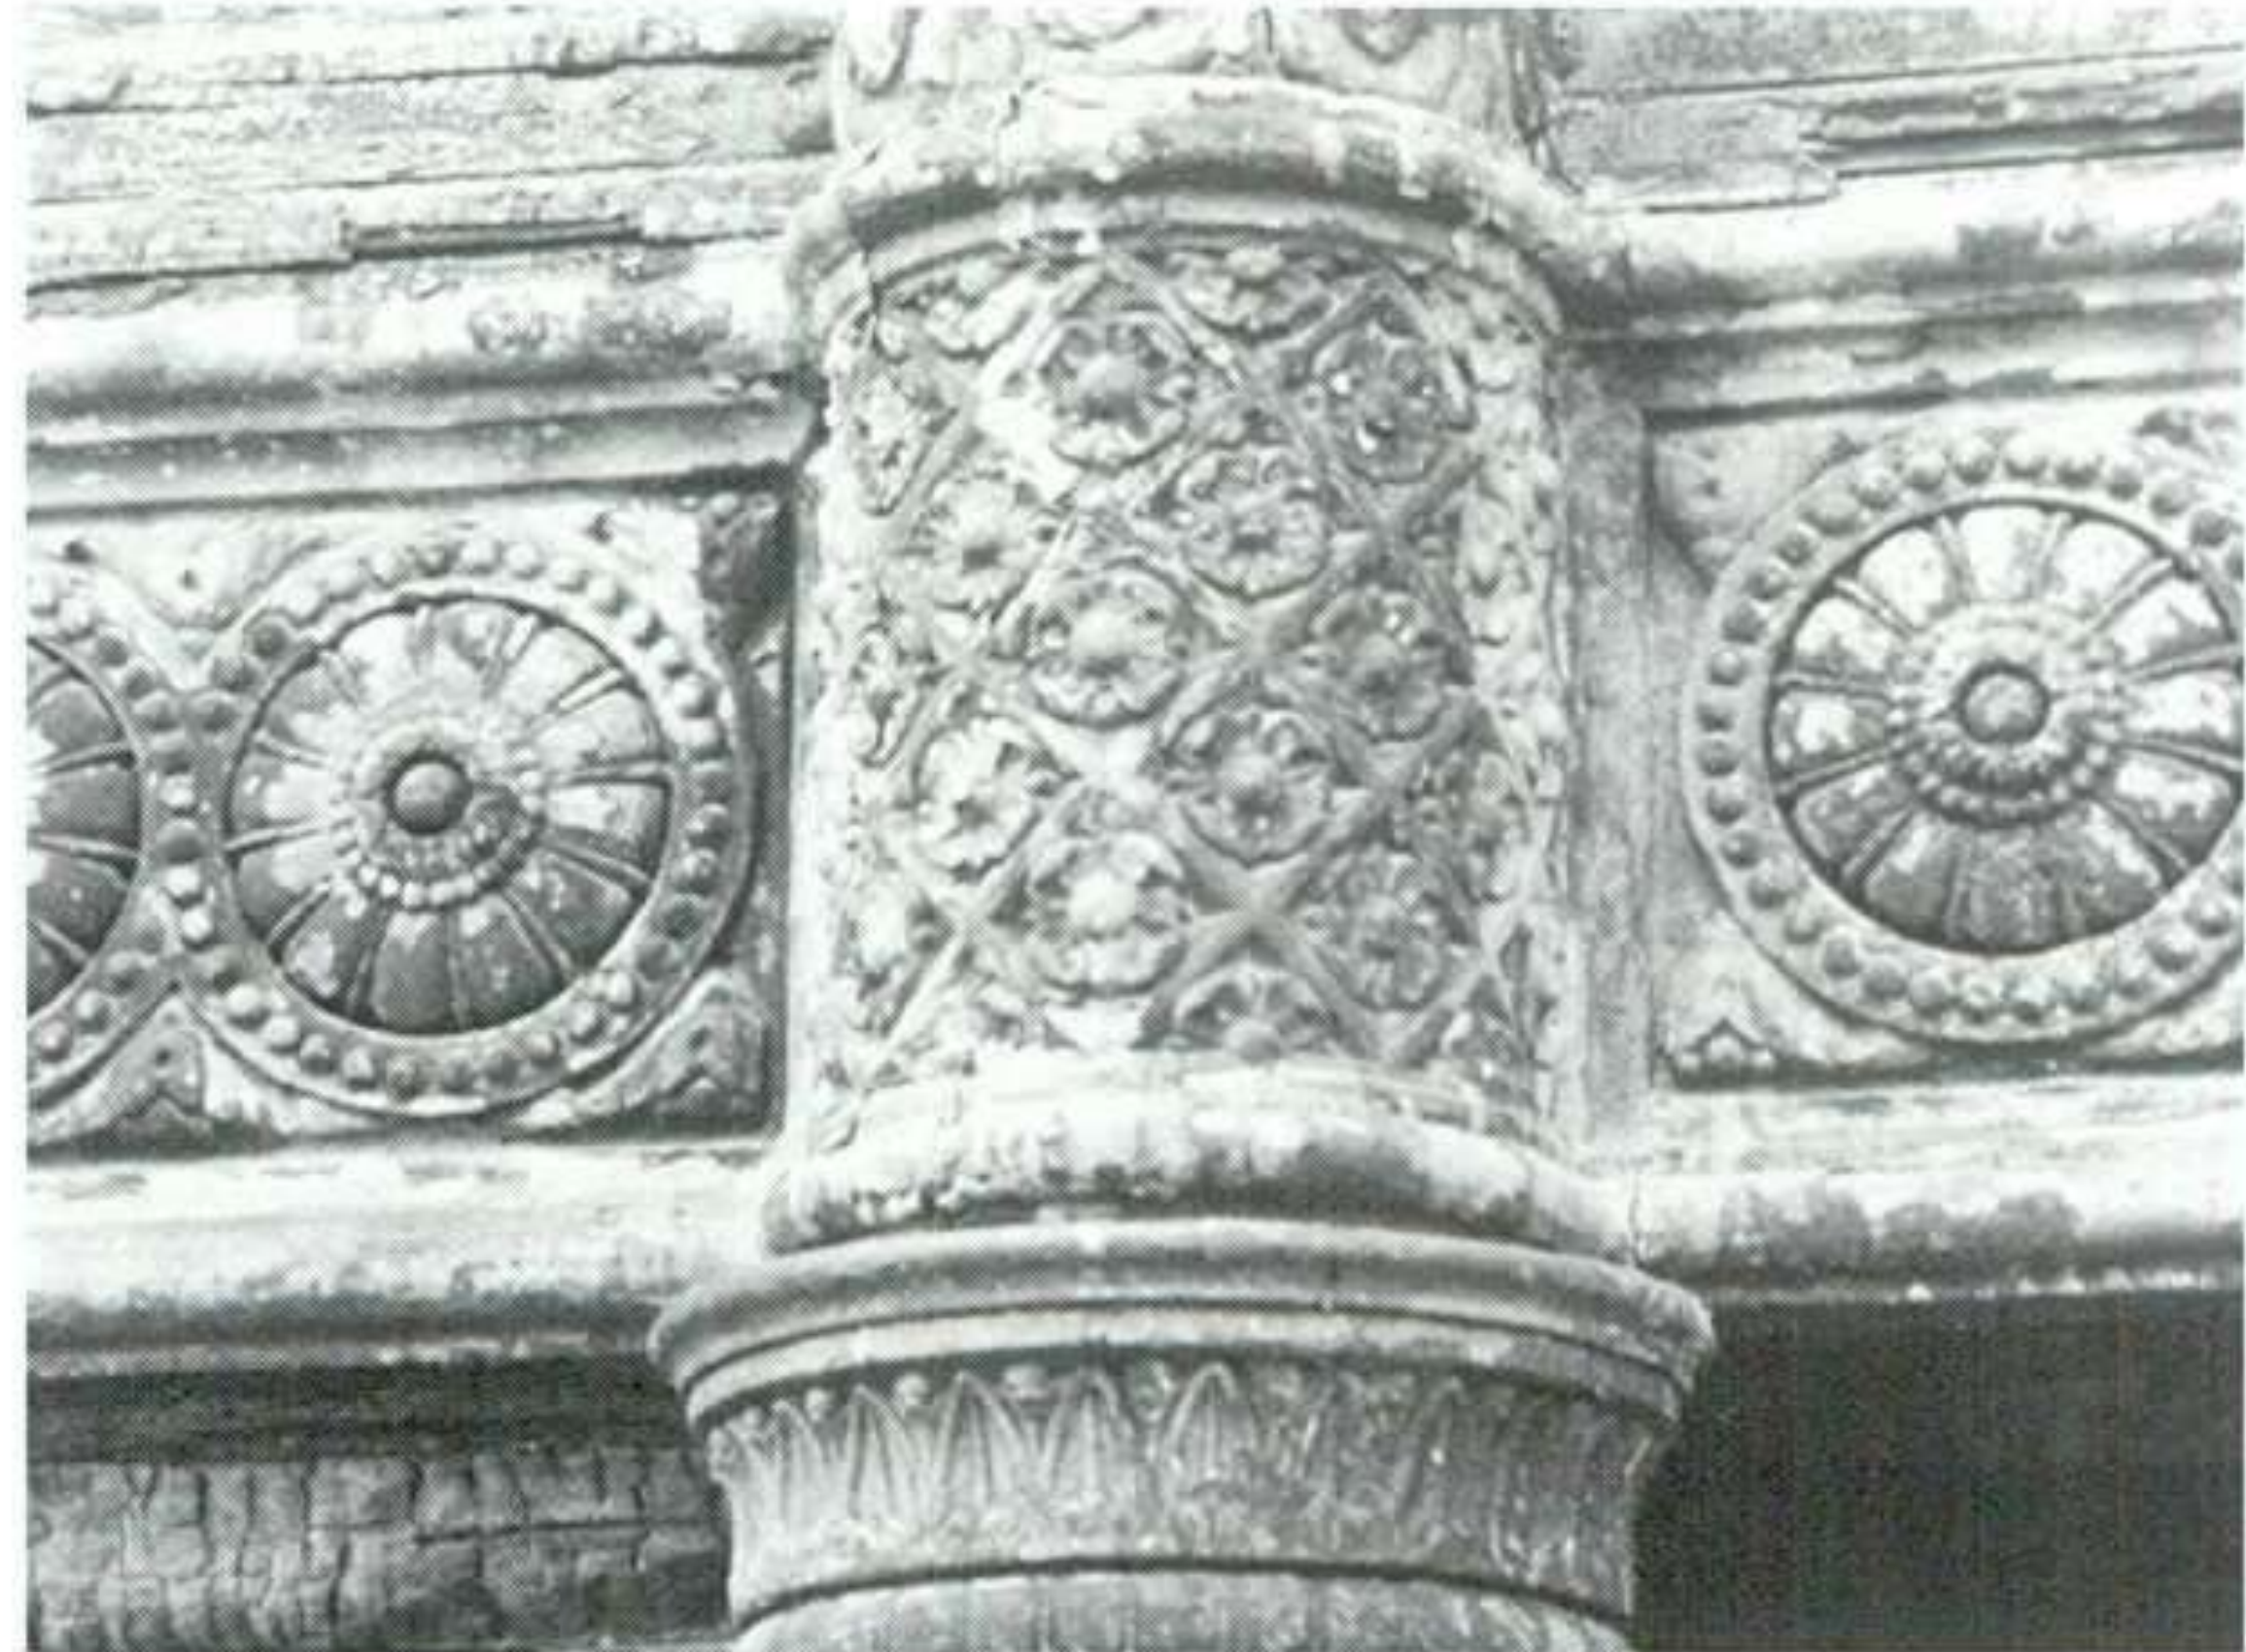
(b) Fire damage on a cast iron panel at the Ca d'aro building, Glasgow.
